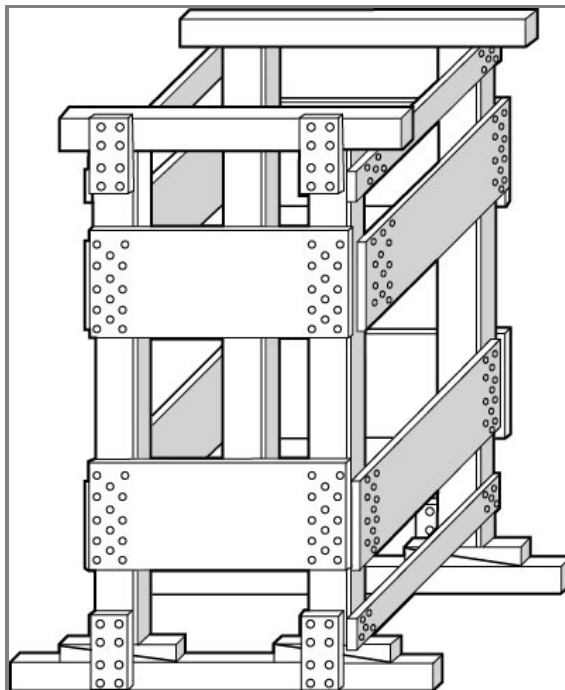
(c) Sloped Floor Shore Type 2.
